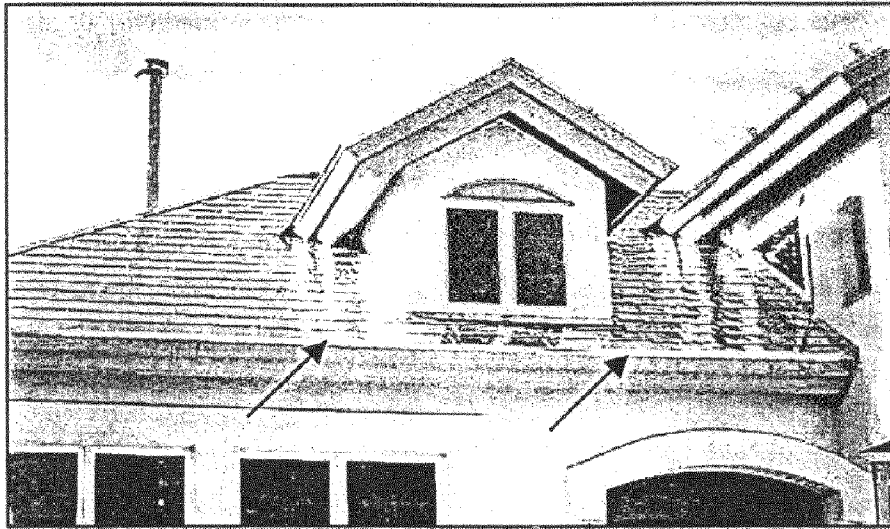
The main purpose of the metal flashing is to prevent the wind from entering between the roof covering and the exterior beam, which would initiate the separation of the roof covering creating an initial point of failure for the entire roof system.
